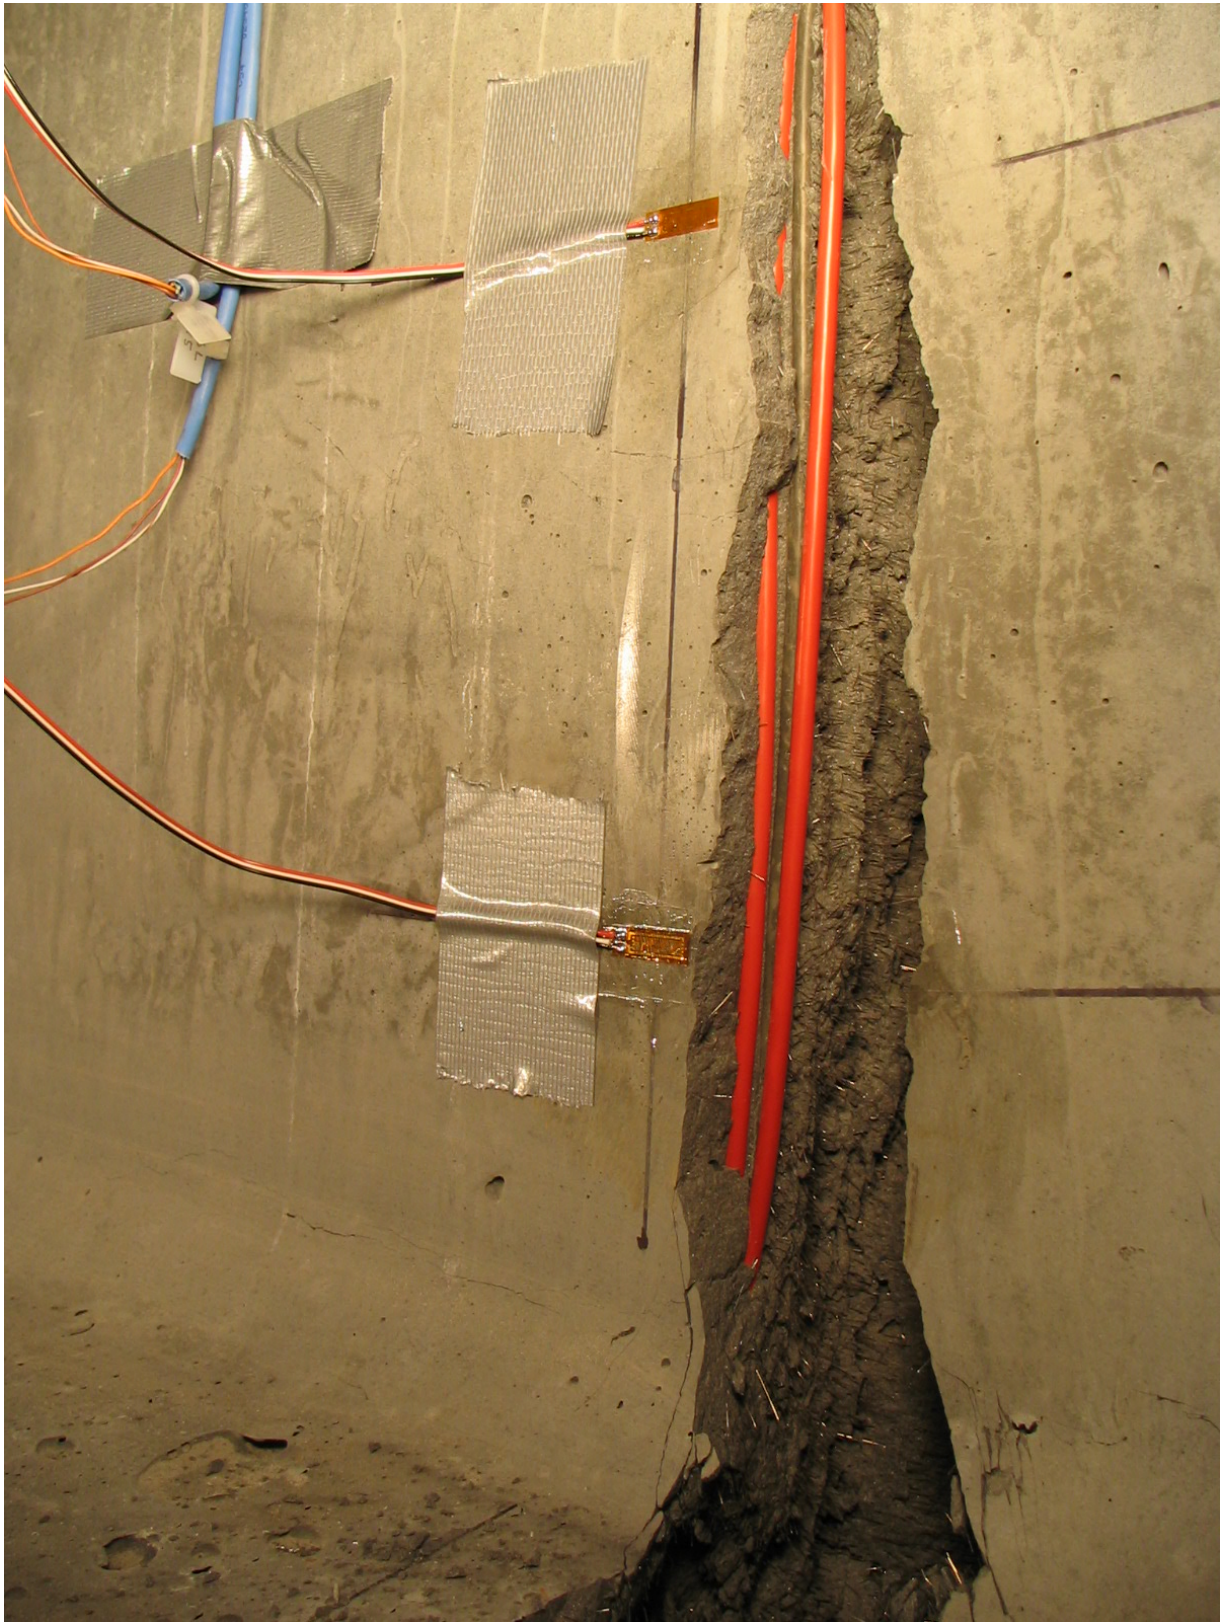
Photo. West failure surface of Girder P4-45F south web.
